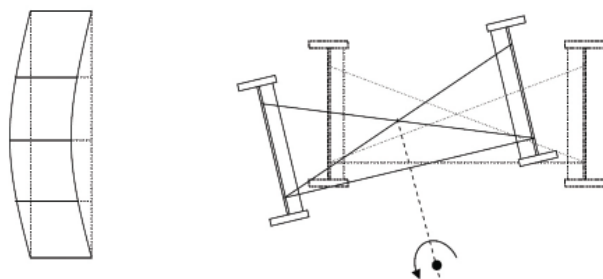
BUCKLING OF PAIRED BEAMS PRIOR TO CONCRETE HARDENING
